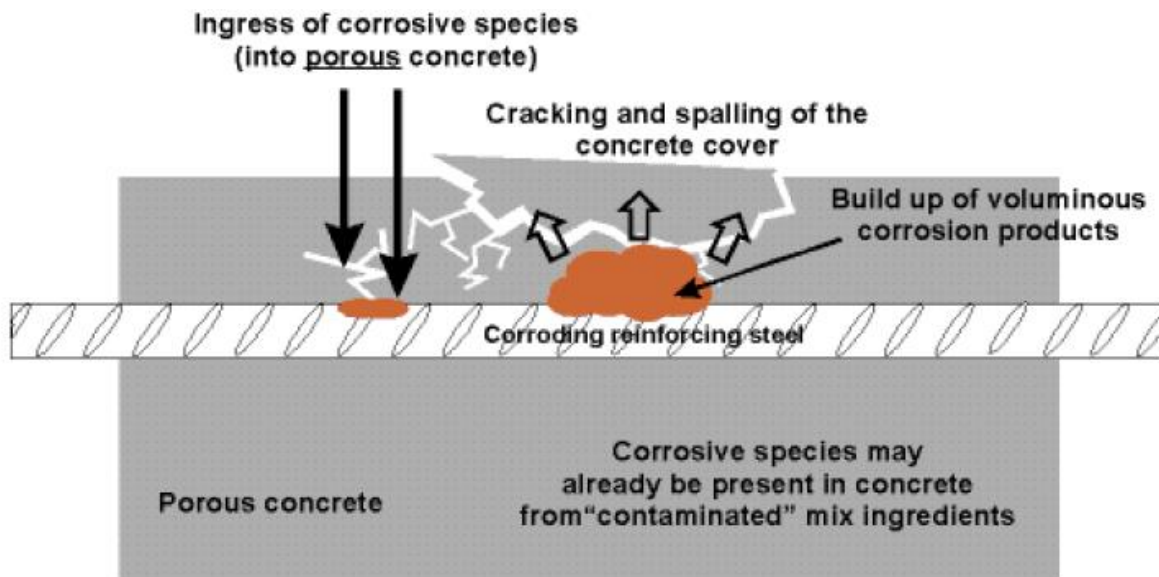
Cracking and spalling of concrete cover due to corrosion of reinforcement (Ahmad and Shabir, 2005)
